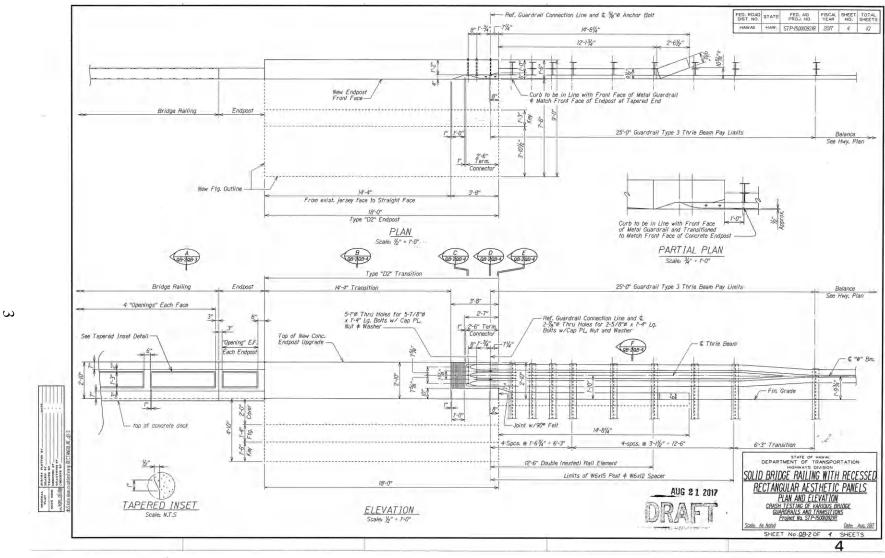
HDOT Standard Detail for the 34-in. Tall, Aesthetic Concrete Bridge Rail
